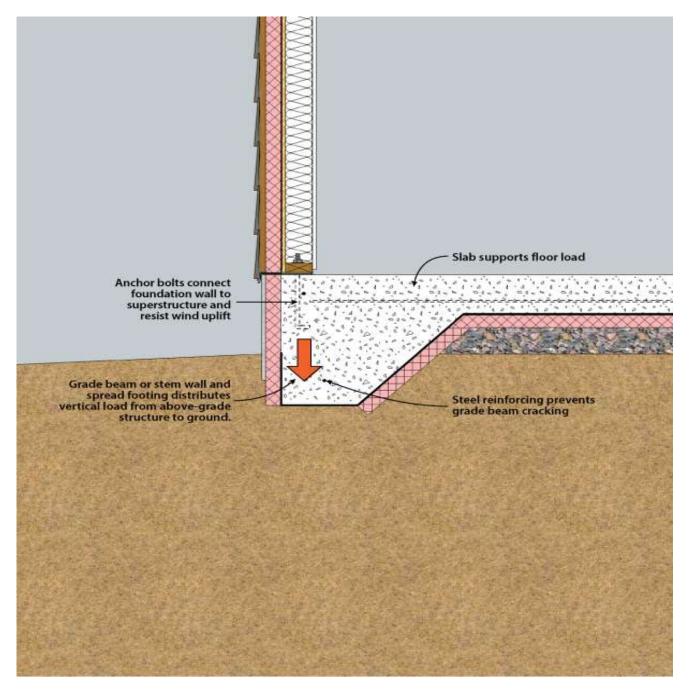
Structural System Components of Slab-on-Grade Foundation with Grade Beam
